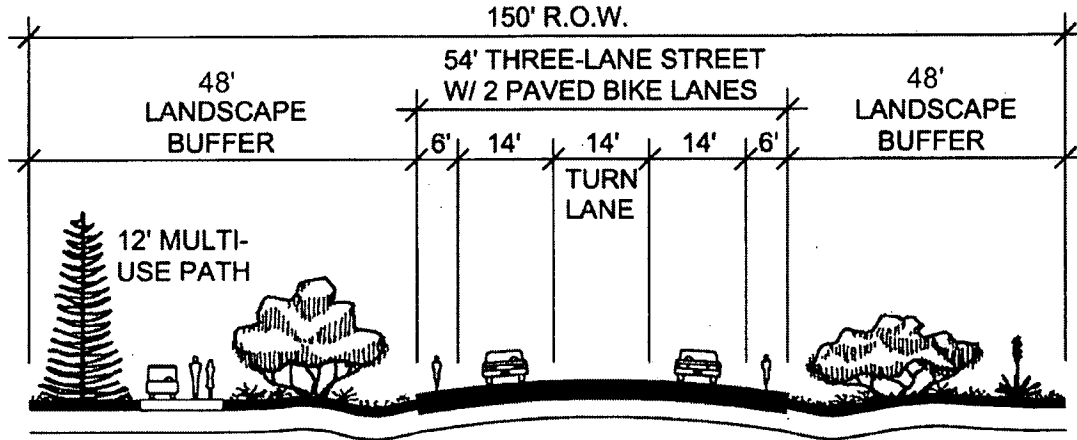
Cross Section – 3-Lane Commercial Street (150' ROW)
